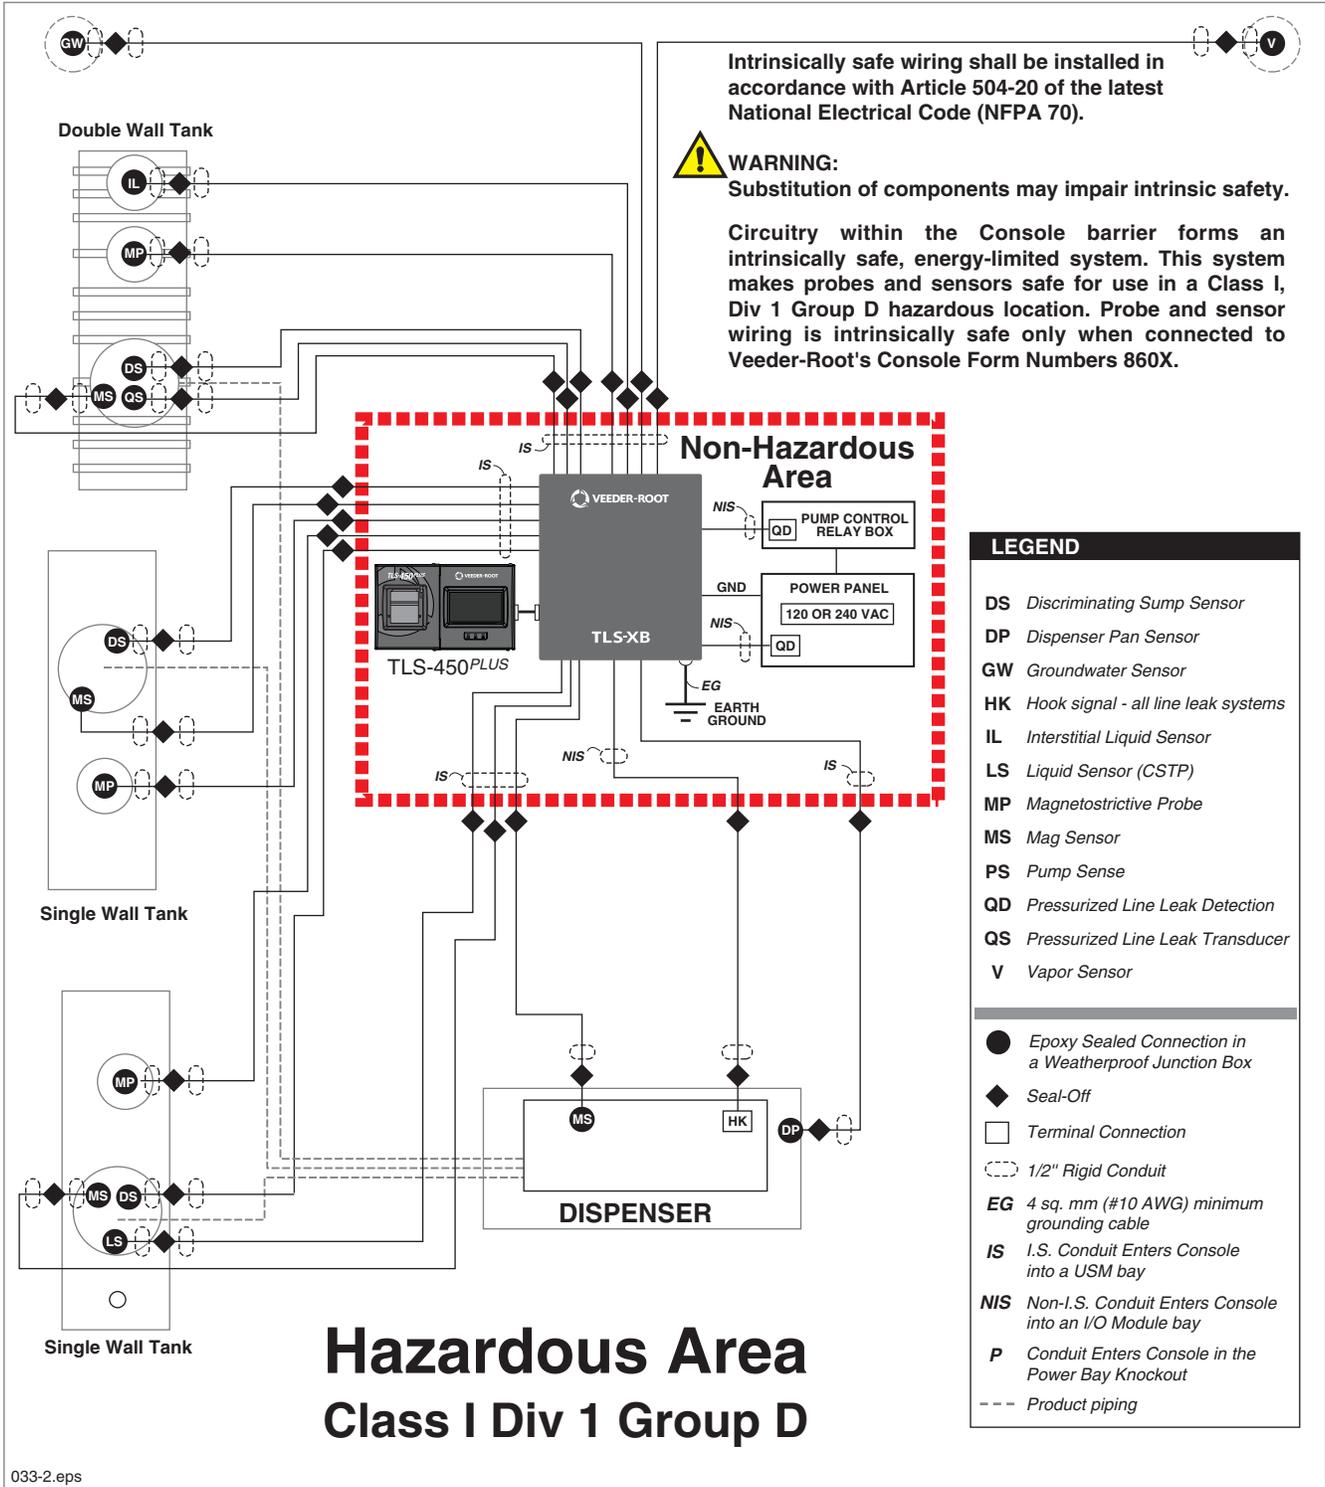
TLS-XB System Typical Site/Forecourt Layout
